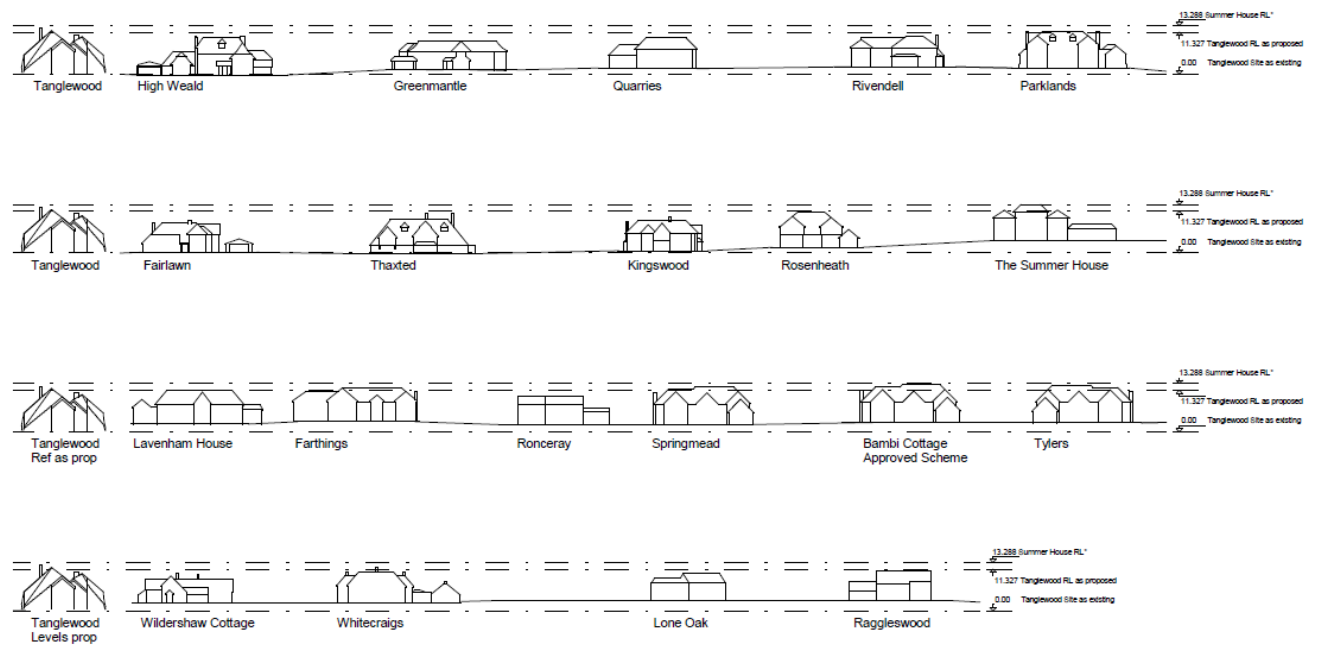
Street Elevations Along Parkfield as Refused (18/03836/FUL):
